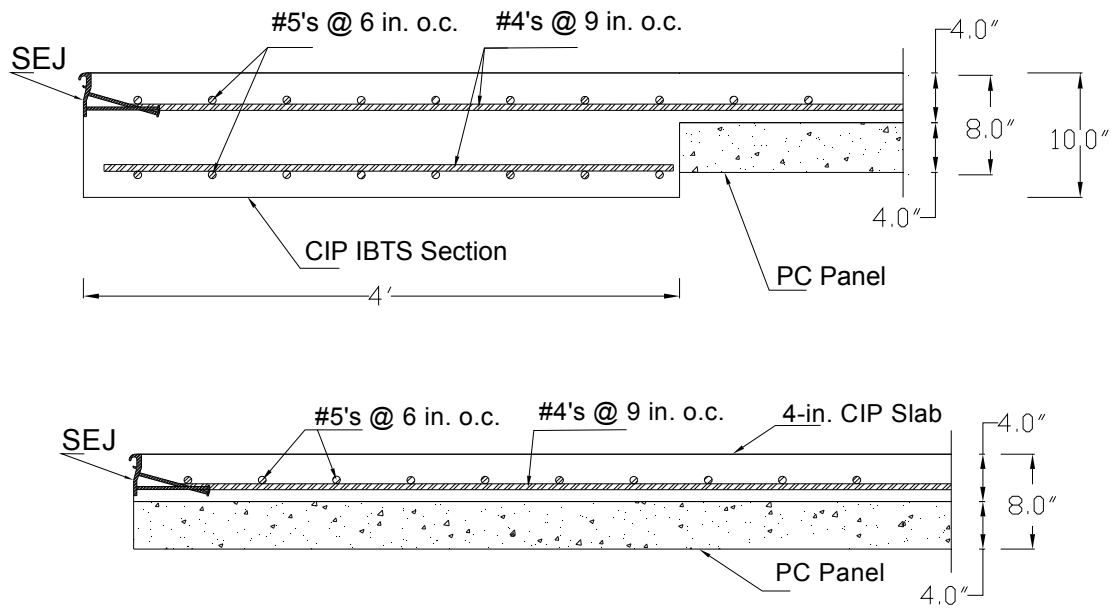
Comparison of Traditional IBTS Detail at Expansion Joint (top) and Precast Panels at Expansion Joint (bottom)
